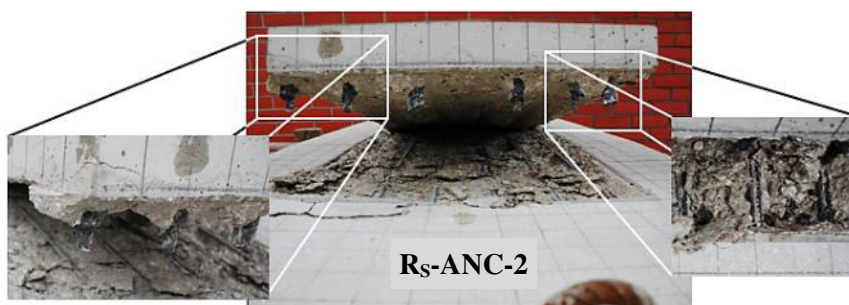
Failure for specimens with small anchorage length of the longitudinal rebars ( $R_S$ -ANC-2).
